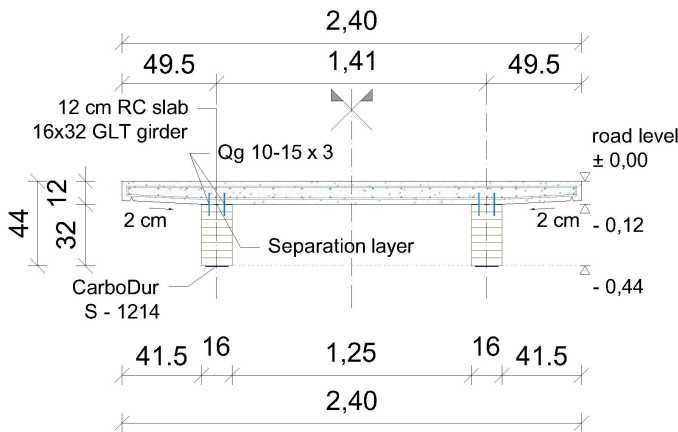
Cross-section of the two girders bridge model (TC-A)
